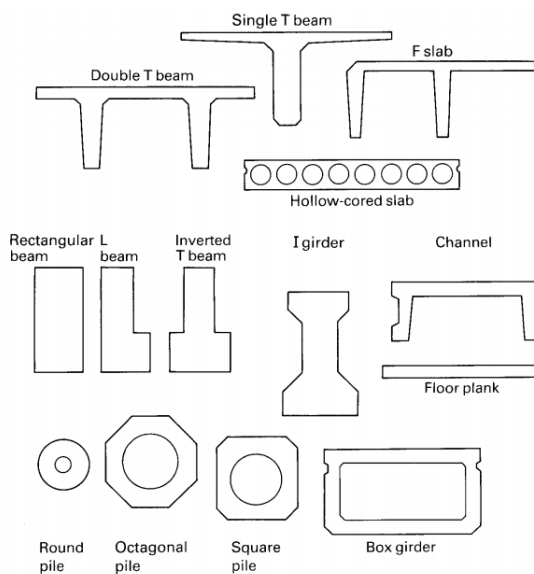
Typical cross section of precast pre-tensioned concrete (Gilbert & Mickleborough, 1990)
